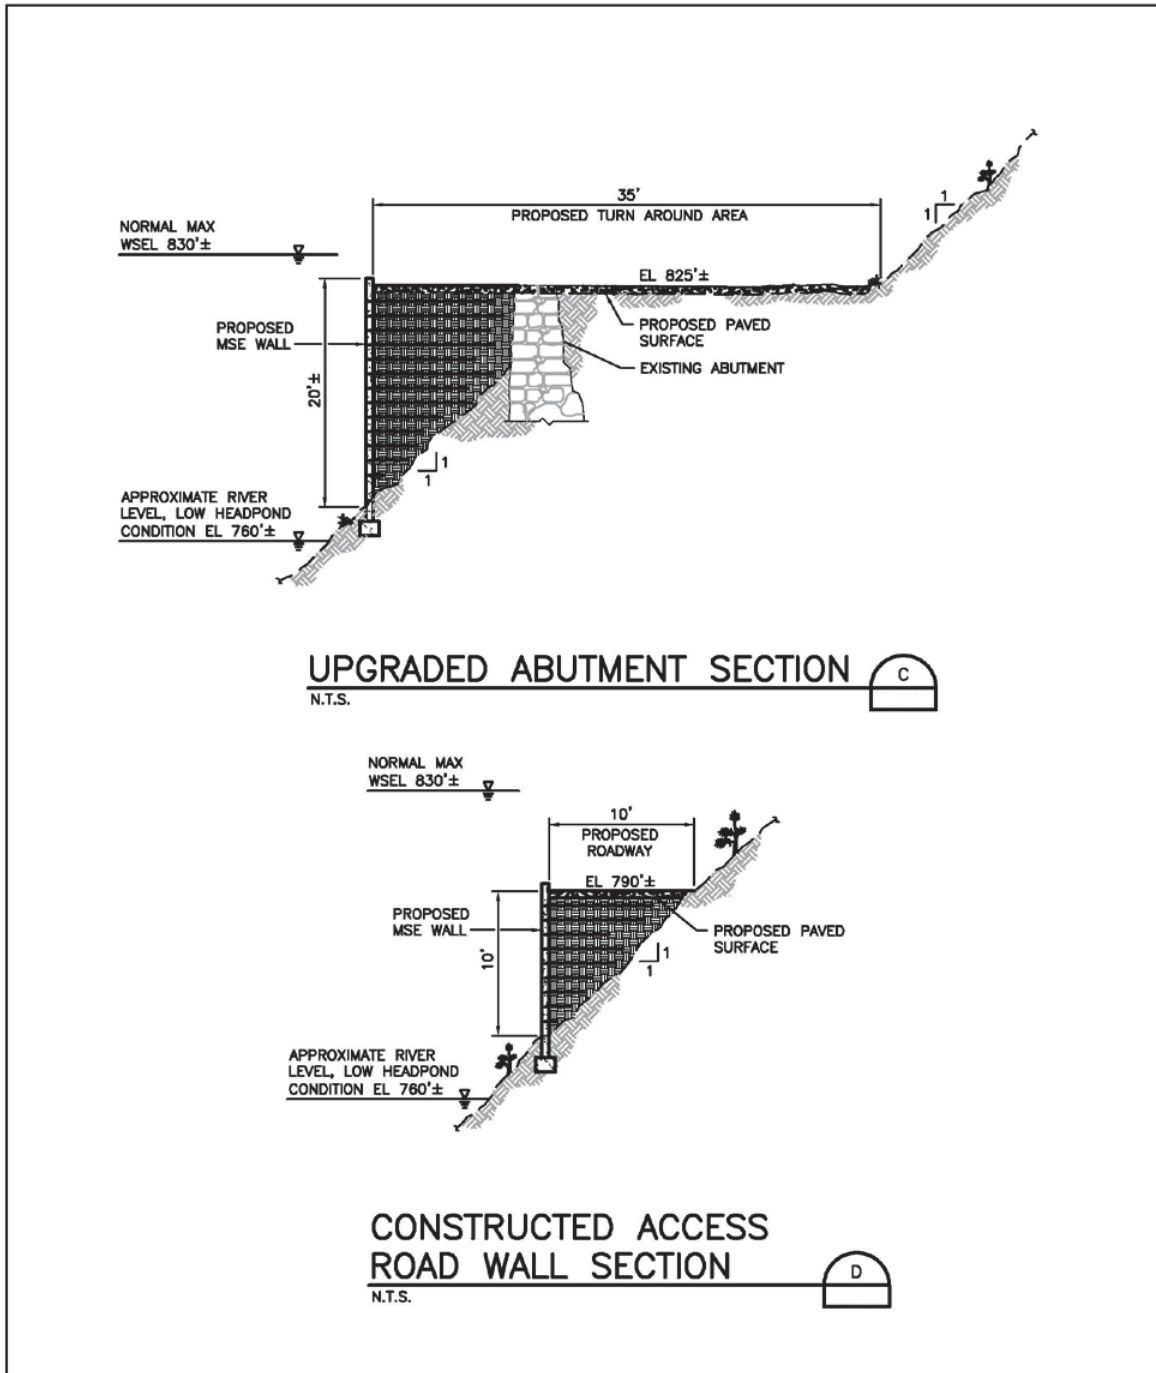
Ward's Ferry bridge whitewater boating take-out improvements -- sections.
